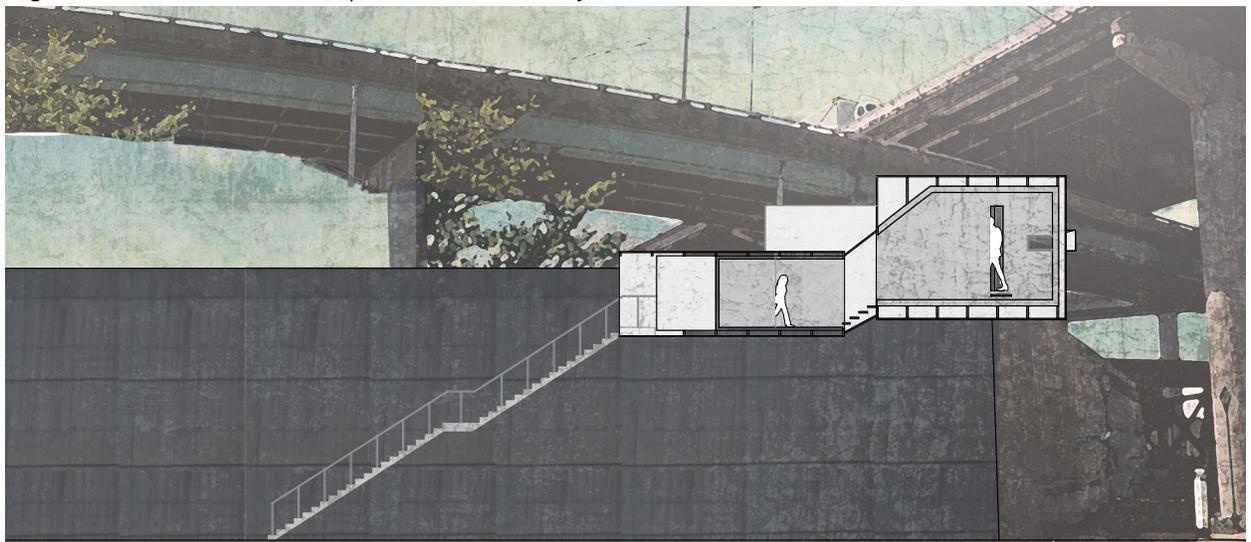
// Wall Soundscape Ladder Section // By team
